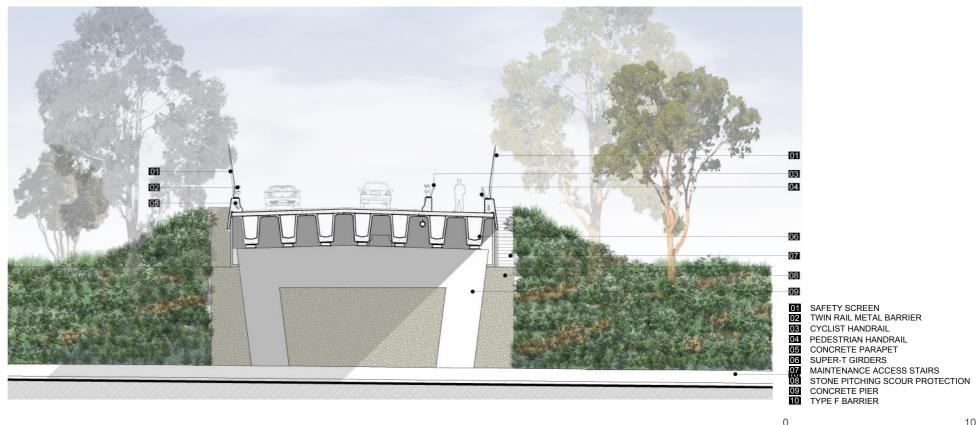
Bridge over HW10 on Sancrox Service Road No. 1: Section
